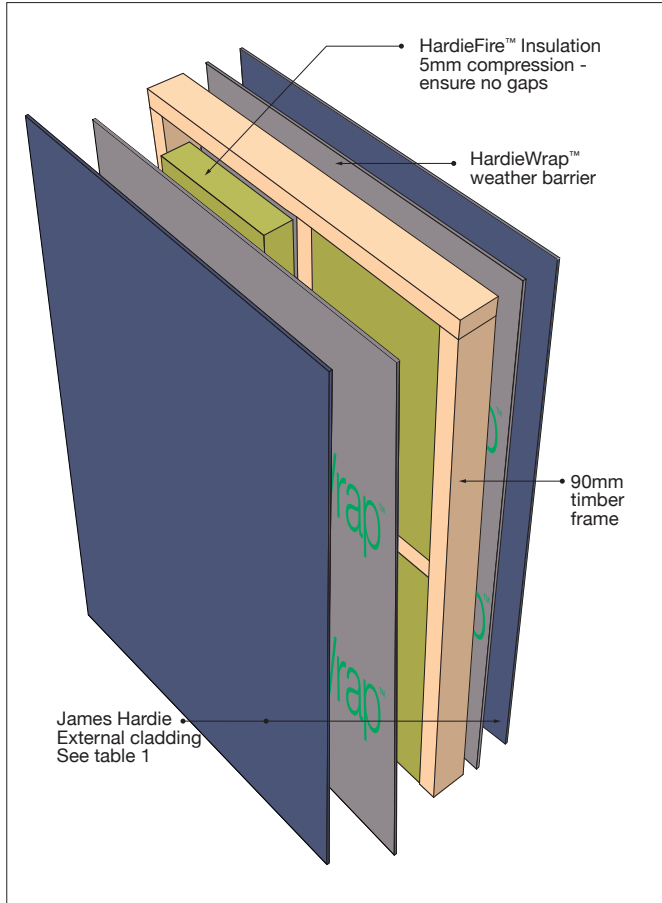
HARDIESMART™ BLADE WALL SYSTEM
